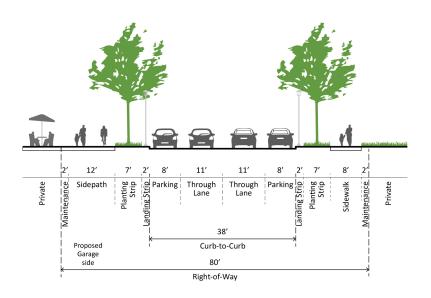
Proposed Typical Street Section for Walter Johnson Road
